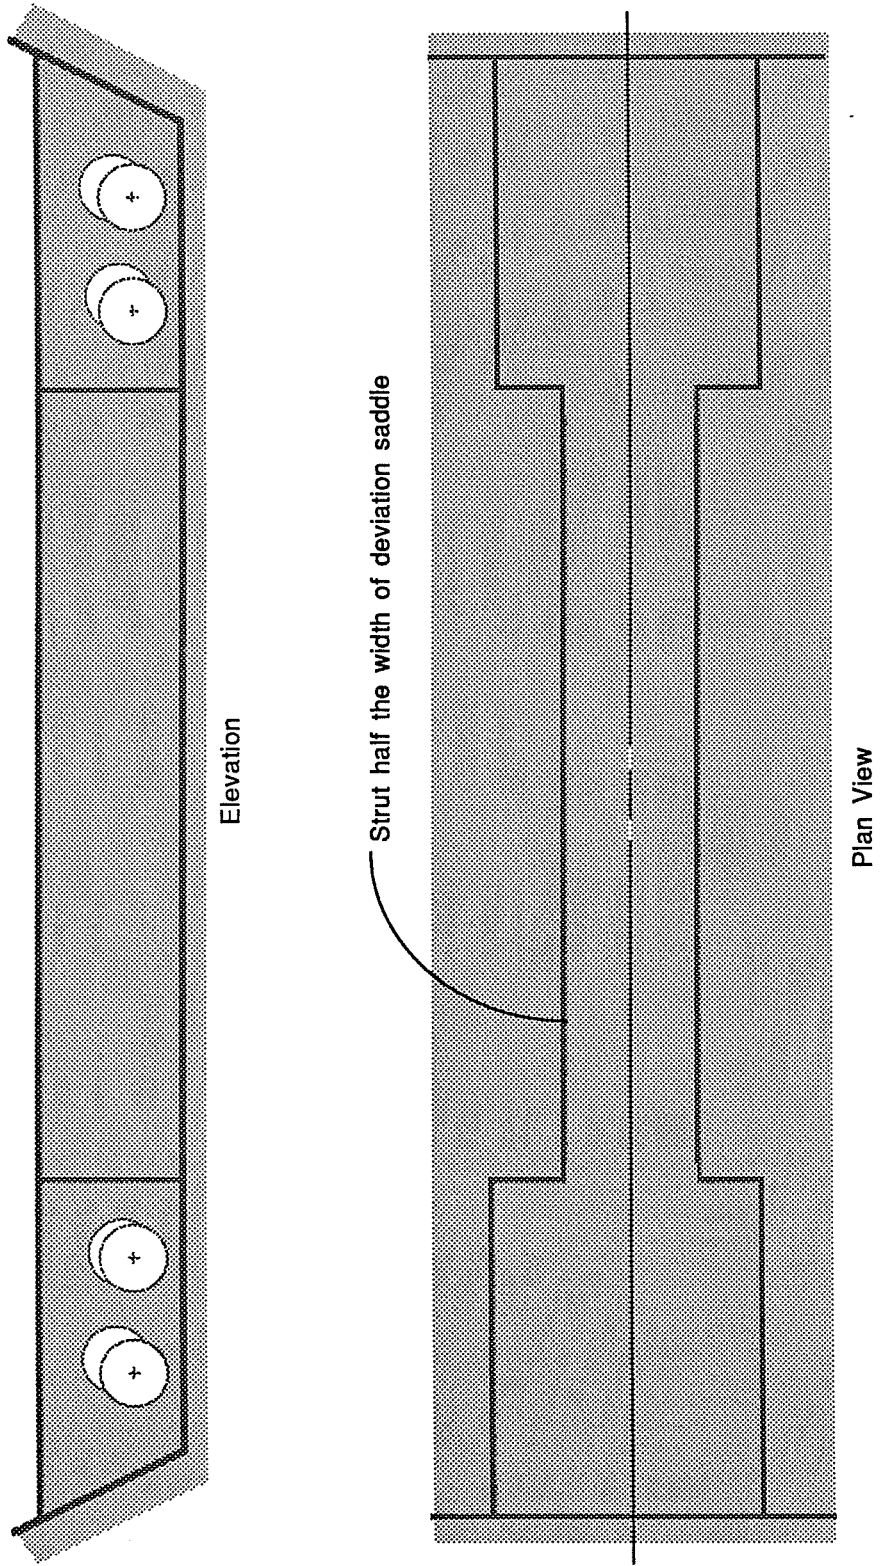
Plan And Elevation of Full Bottom Flange Deviation Saddle
